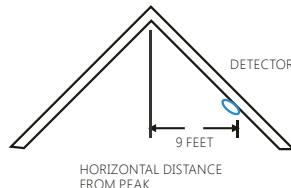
recommended locations to mount smoke detectors in rooms with sloped, gabled, or peaked ceiling
